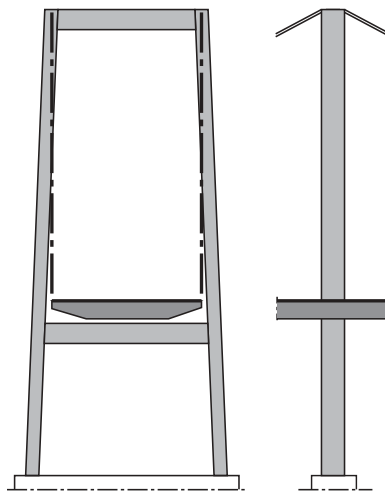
Cantilevered deck attached to the pylon for passing of pedestrian lane outside the pylon leg (Golden Gate Bridge)
